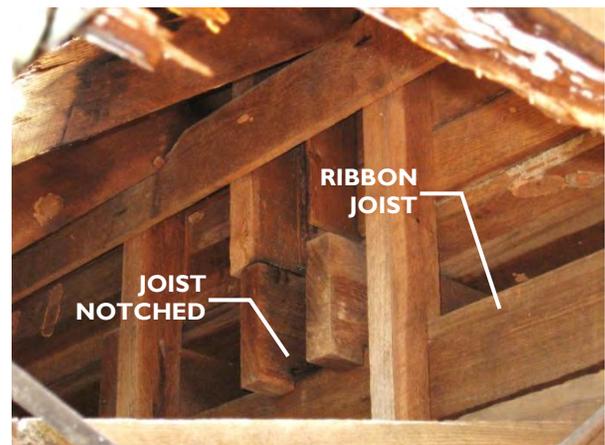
Long House. Framing viewed from porch attic, north wall. Note ribbon joist let in to studs, also joist ends notched over ribbon joist.
